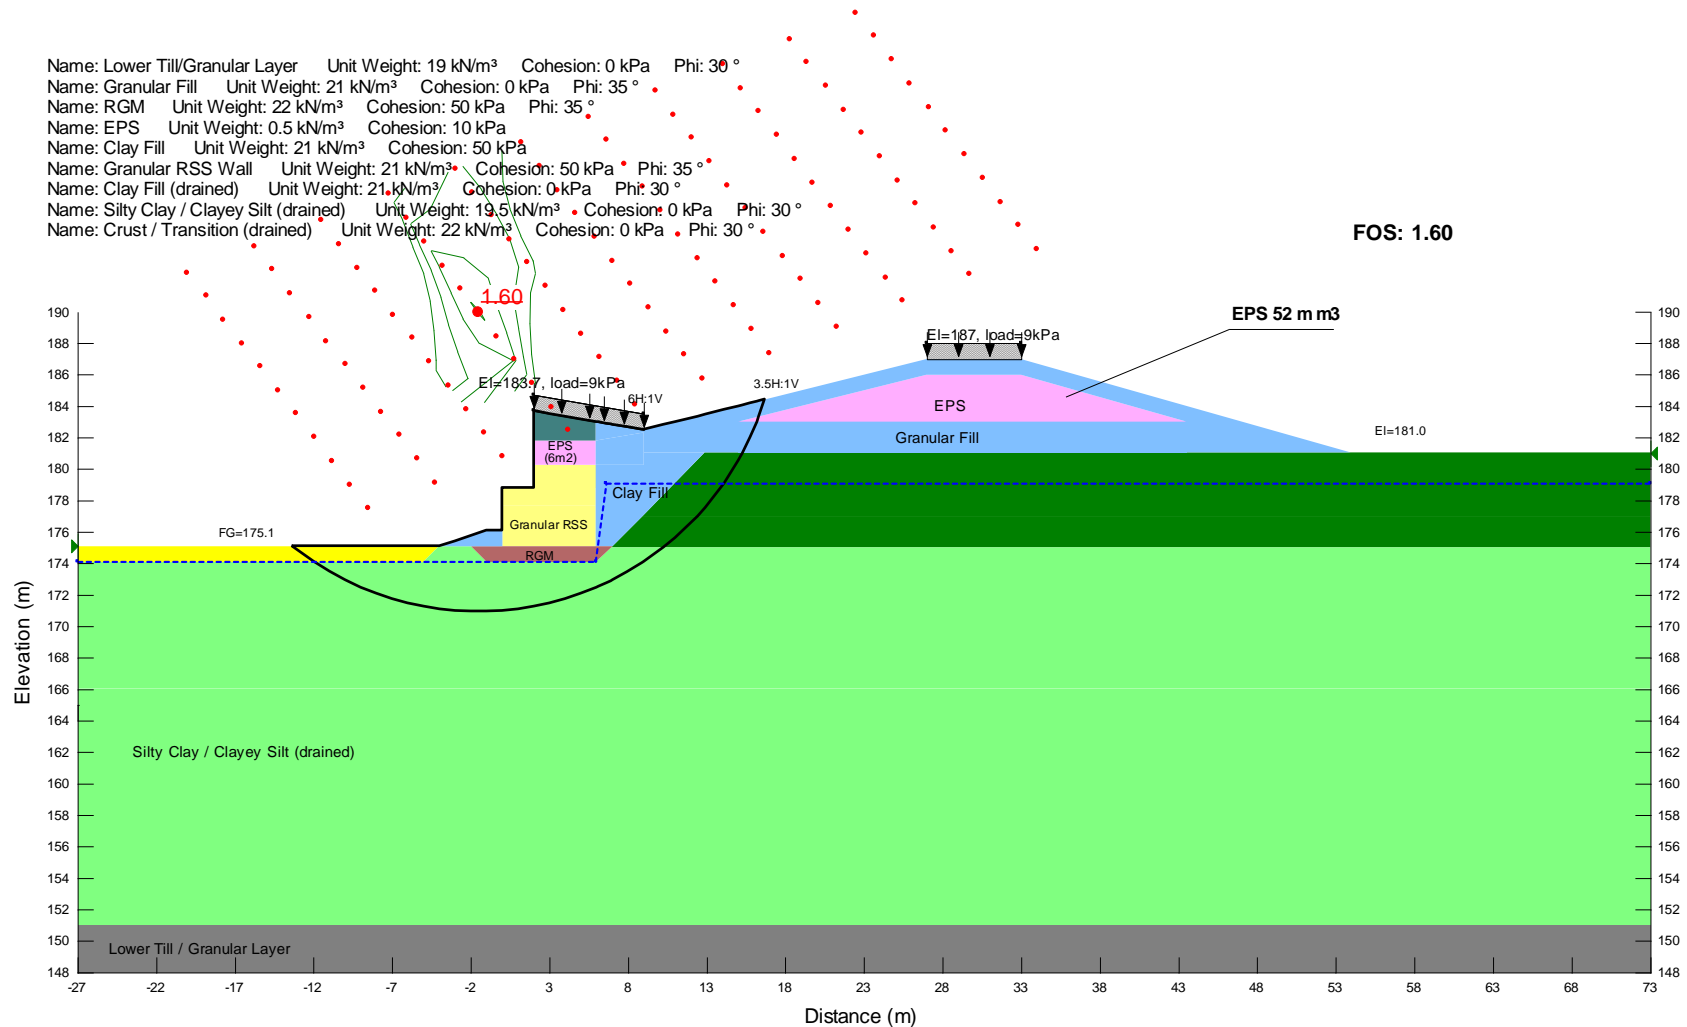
Slope Stability - Short Term - South Abutment with Trail - Station 10+575L Hwy 401
